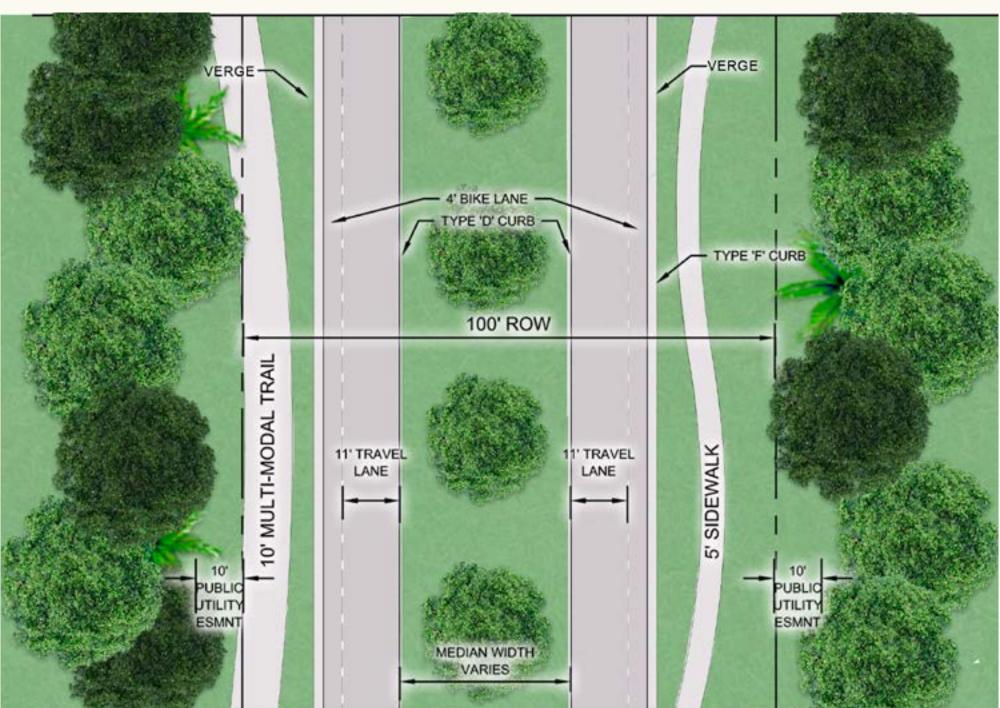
A1 (not to scale) Typical 100' ROW Collector Road Plan Street Tree - In median and verge
